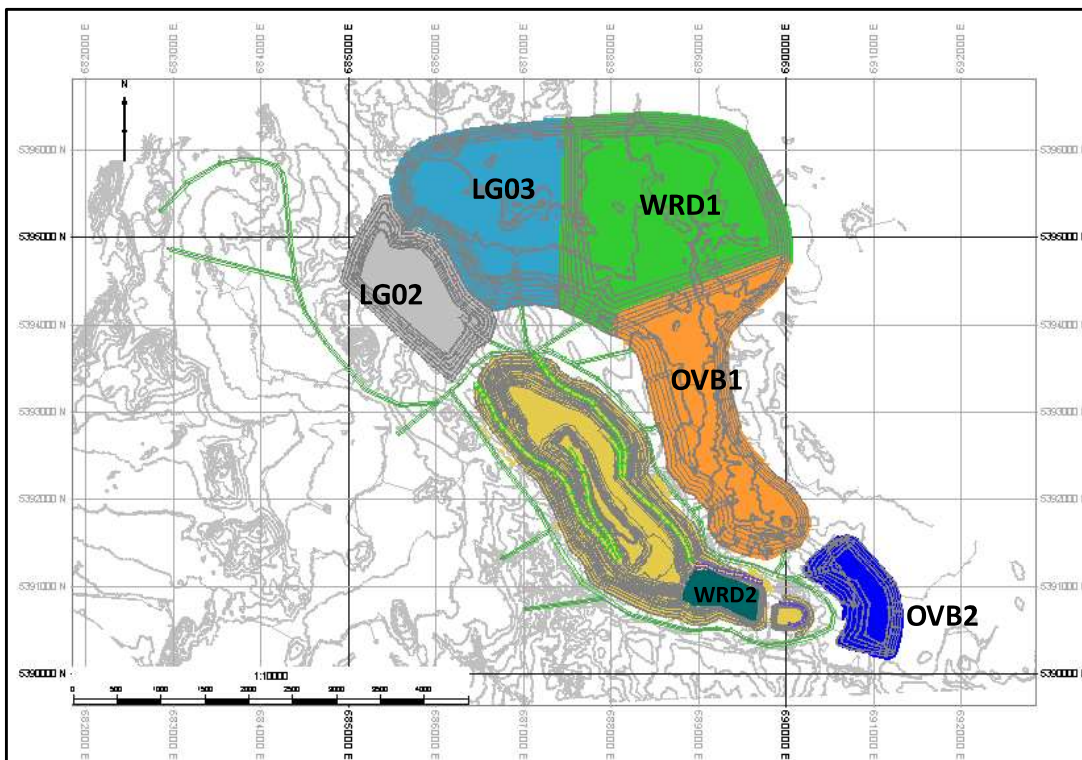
Layout of Dumps & Stockpiles – Year 19
